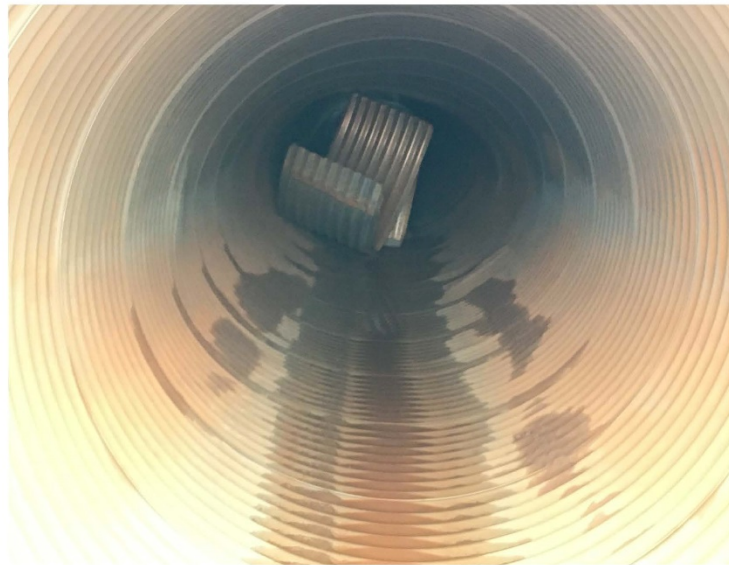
Culvert under site access road (Mine / contact water ditch) - Metal sheet partly obstructing culvert
